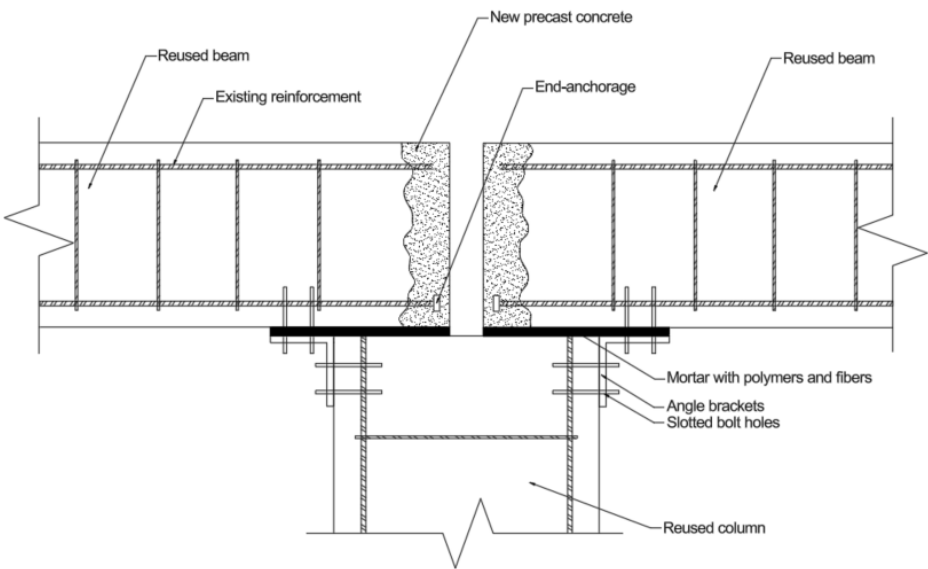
Design proposal hinged double beam-to-column connection with stability assurance
